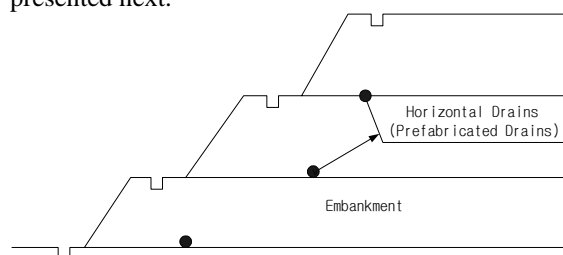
Application to drainage for stabilizing of embankment using clay soil
